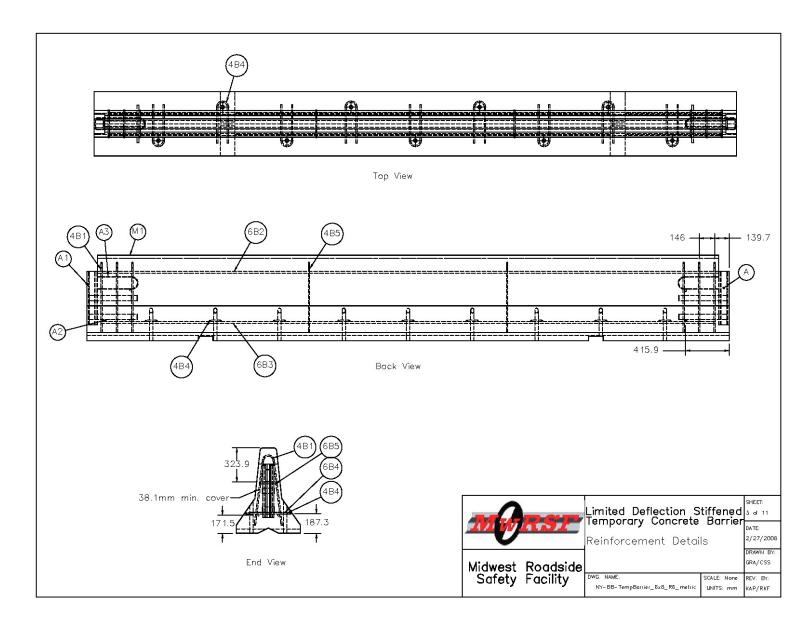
Temporary Concrete Barrier Reinforcement Details, Test NYTCB-3
